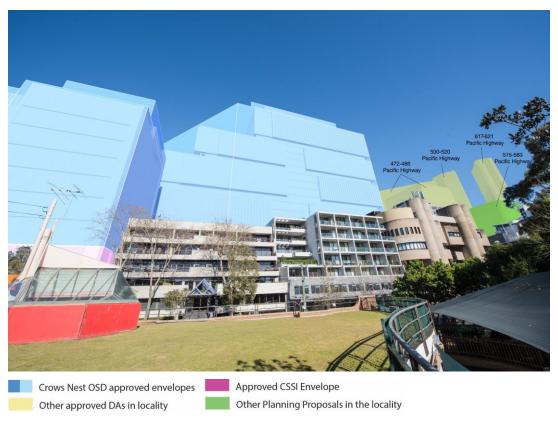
the approved building envelopes as viewed from Hume Street Park, Crows Nest
